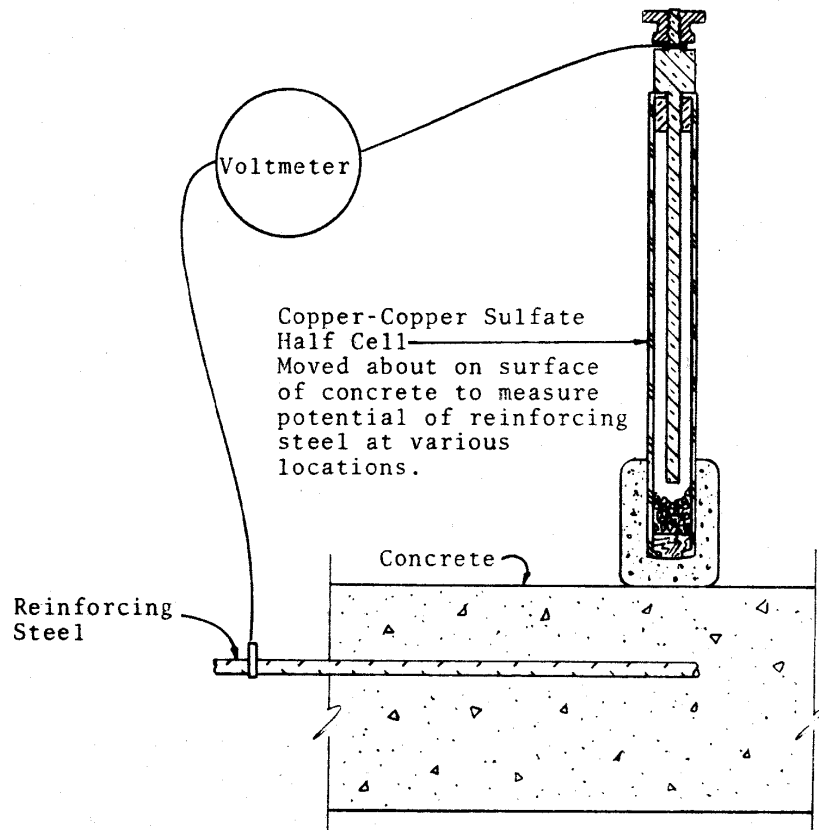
Testing electrical continuity of steel reinforcement.
